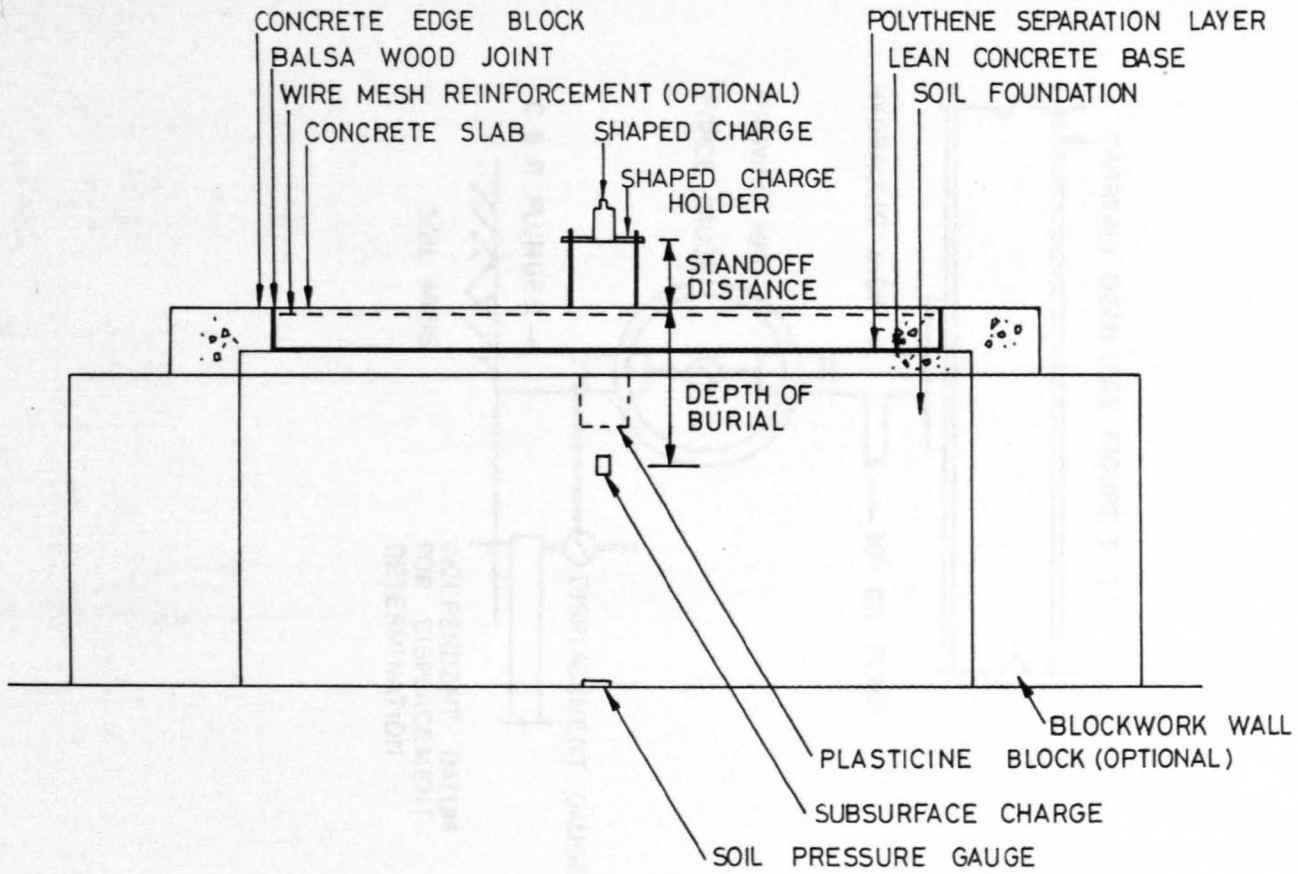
CROSS SECTION OF A TYPICAL TEST BAY SHOWING EXPLOSIVE CHARGE LOCATIONS AND CONSTRUCTION DETAILS
